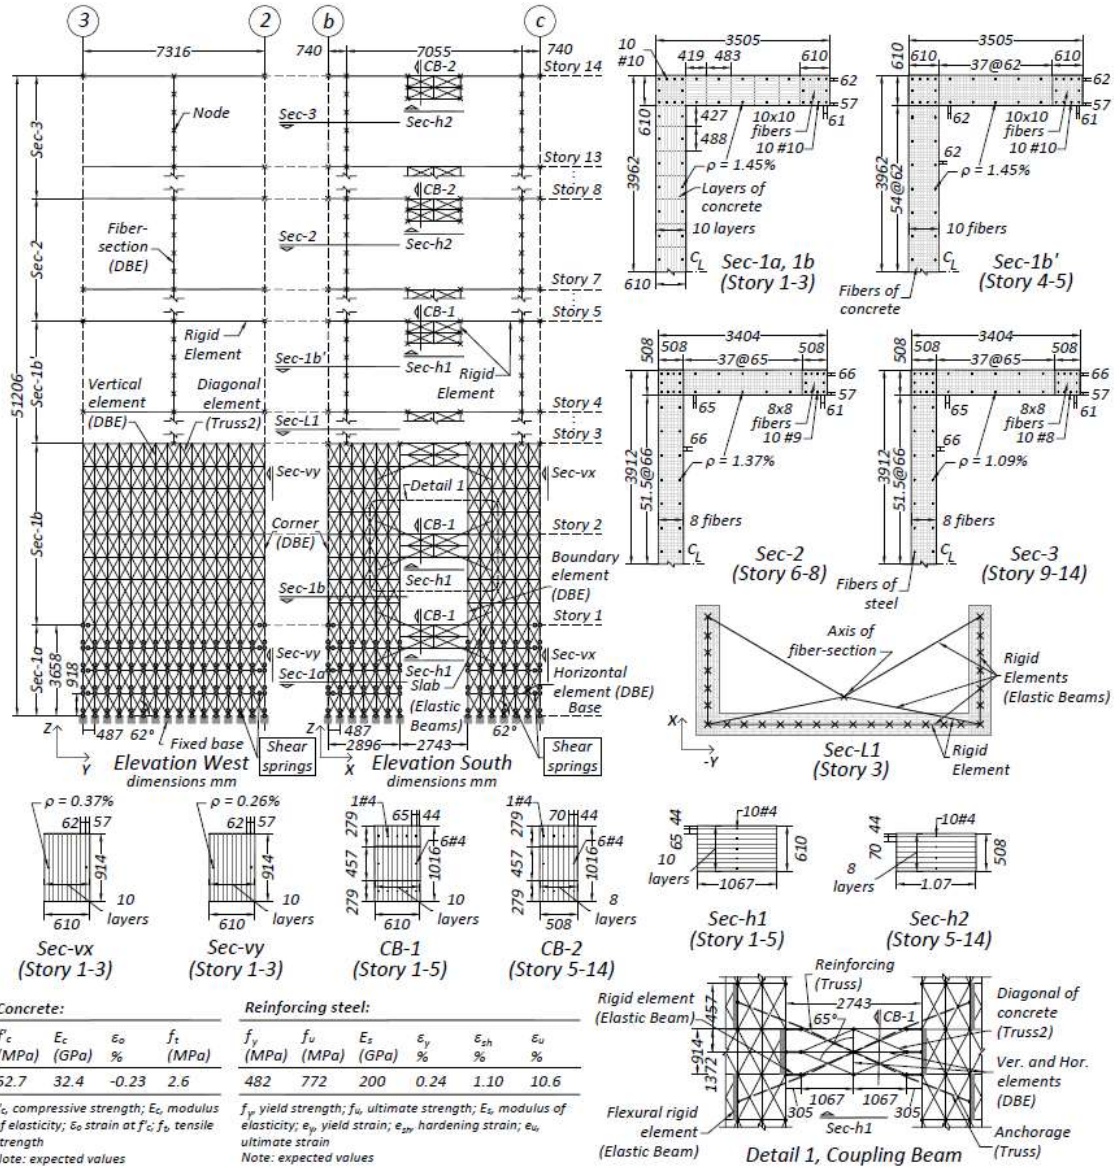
Core Wall case study building, Hybrid Fiber-Section – Enhanced Beam-Truss Model.
